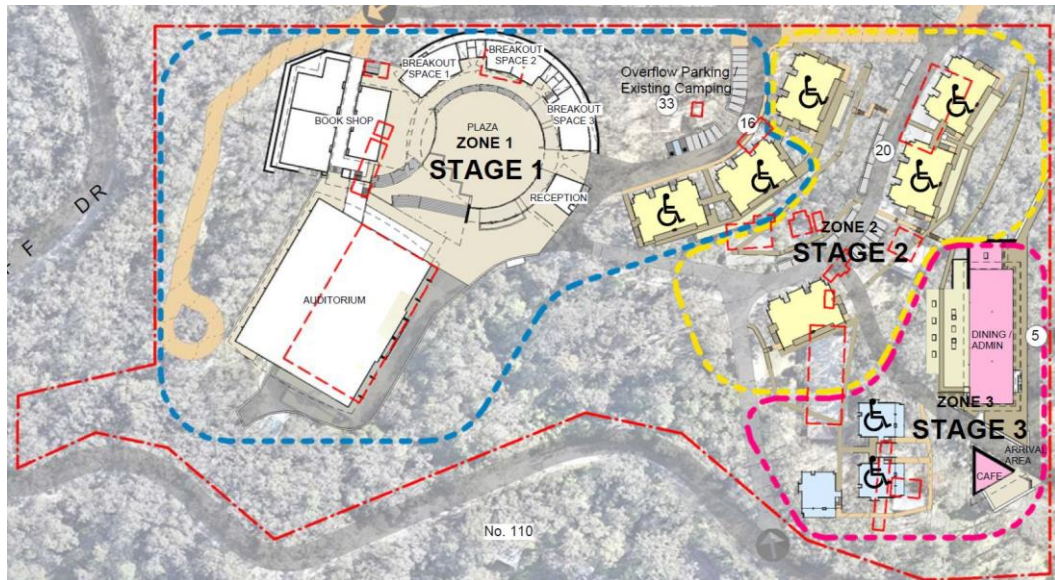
Staged Master Plan indicating the existing structures proposed for demolition identified by the red dashed line. The outer red line indicates the KCC site boundary (Source: NBRSArchitecture, Master Plan – Staging Plan, 14289 – 007, Revision 7, 01.08.17).
